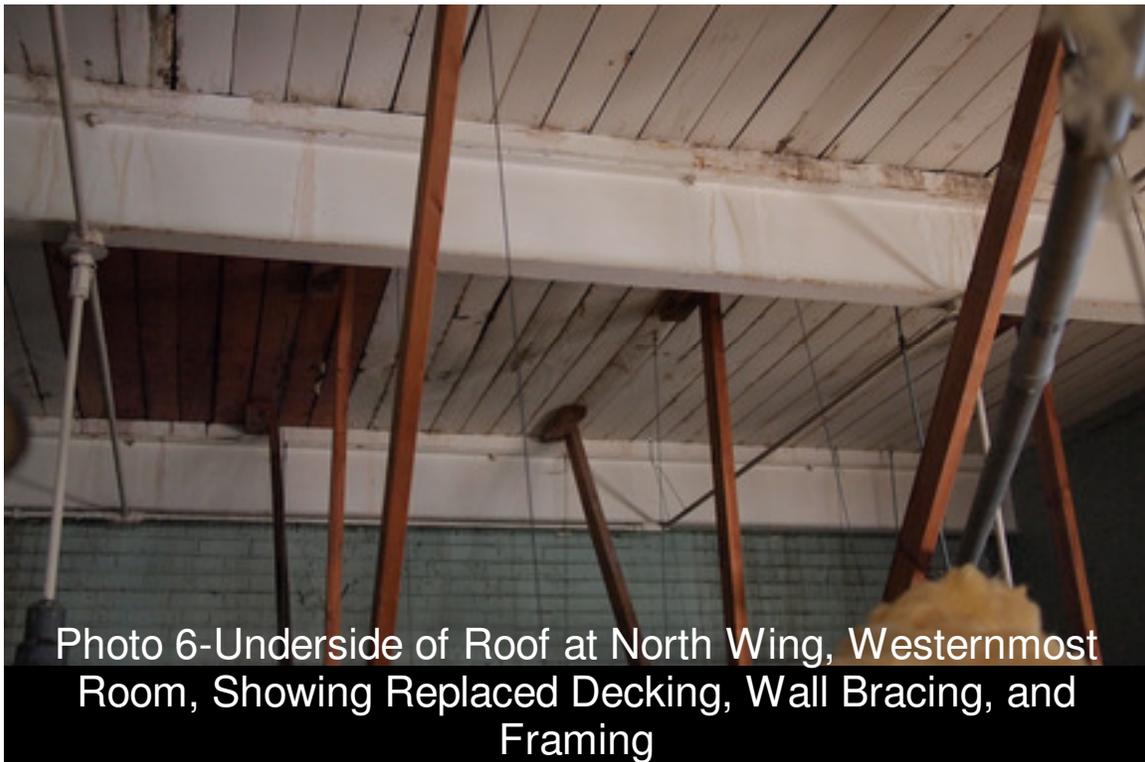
Underside of Roof at North Wing, Westernmost Room, Showing Replaced Decking, Wall Bracing, and Framing
